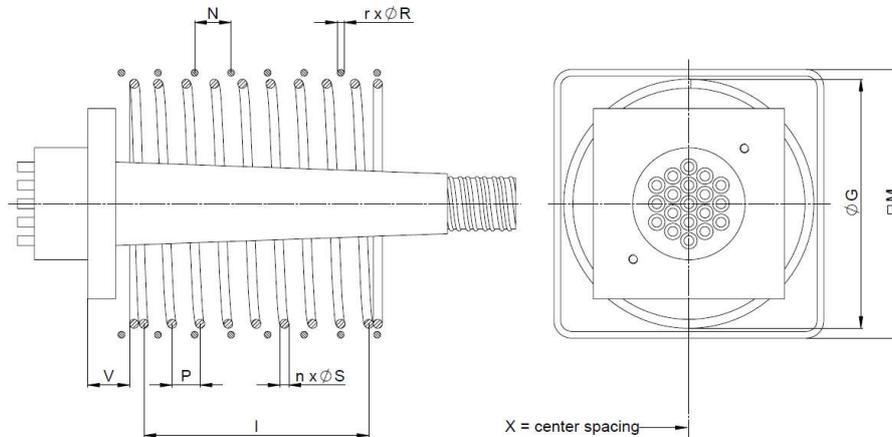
Local anchorage zone reinforcement type E @ 28/35 MPa
